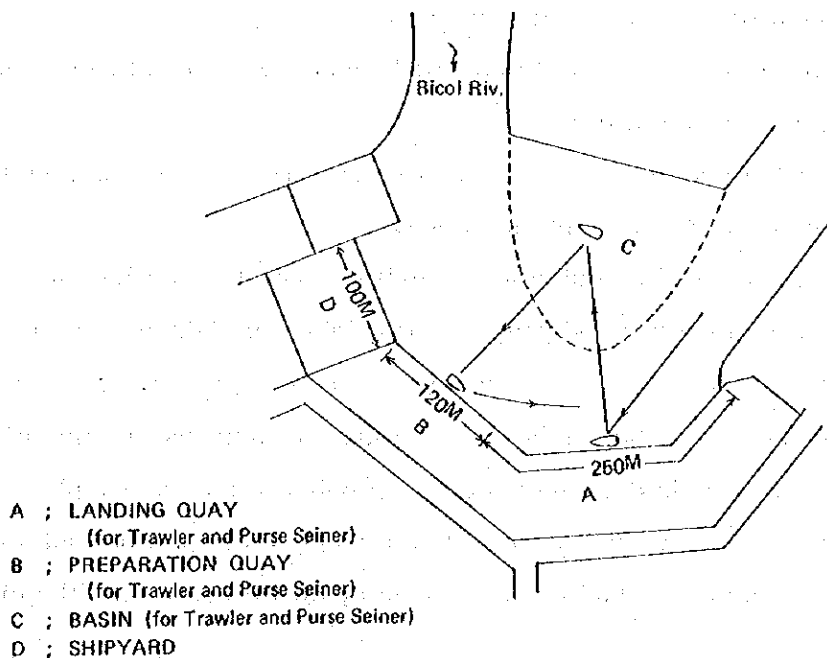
Camaligan Fishing Port Basic Facilities Layout and Utilization Diagram.
